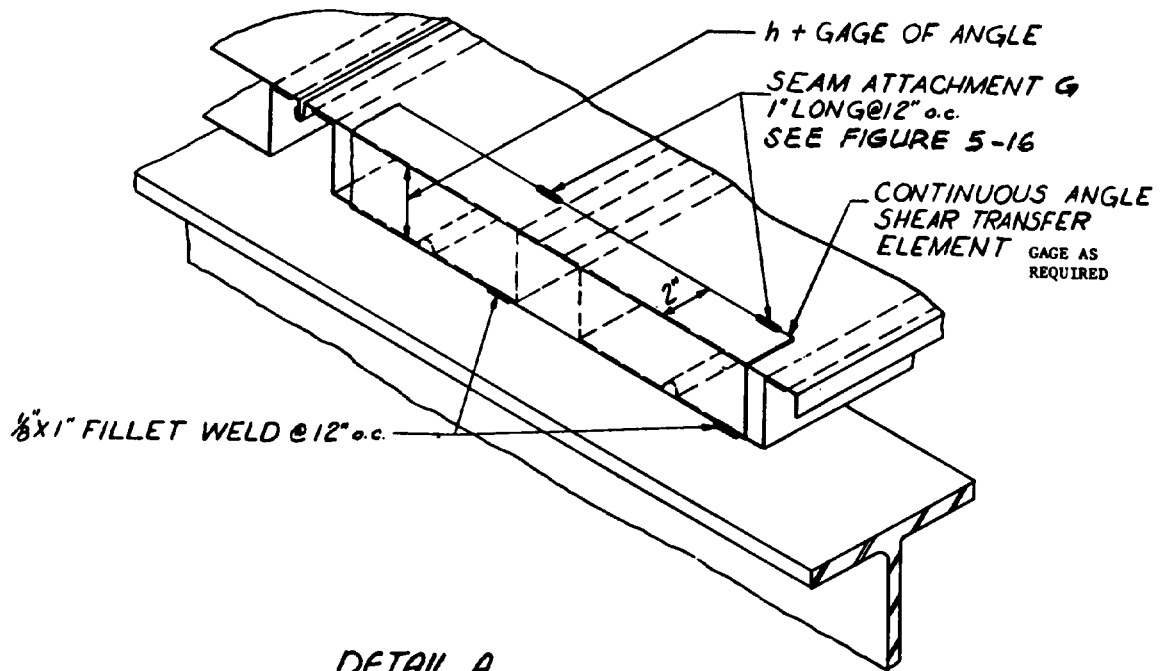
Steel deck diaphragms Type B—typical attachments to frame.
